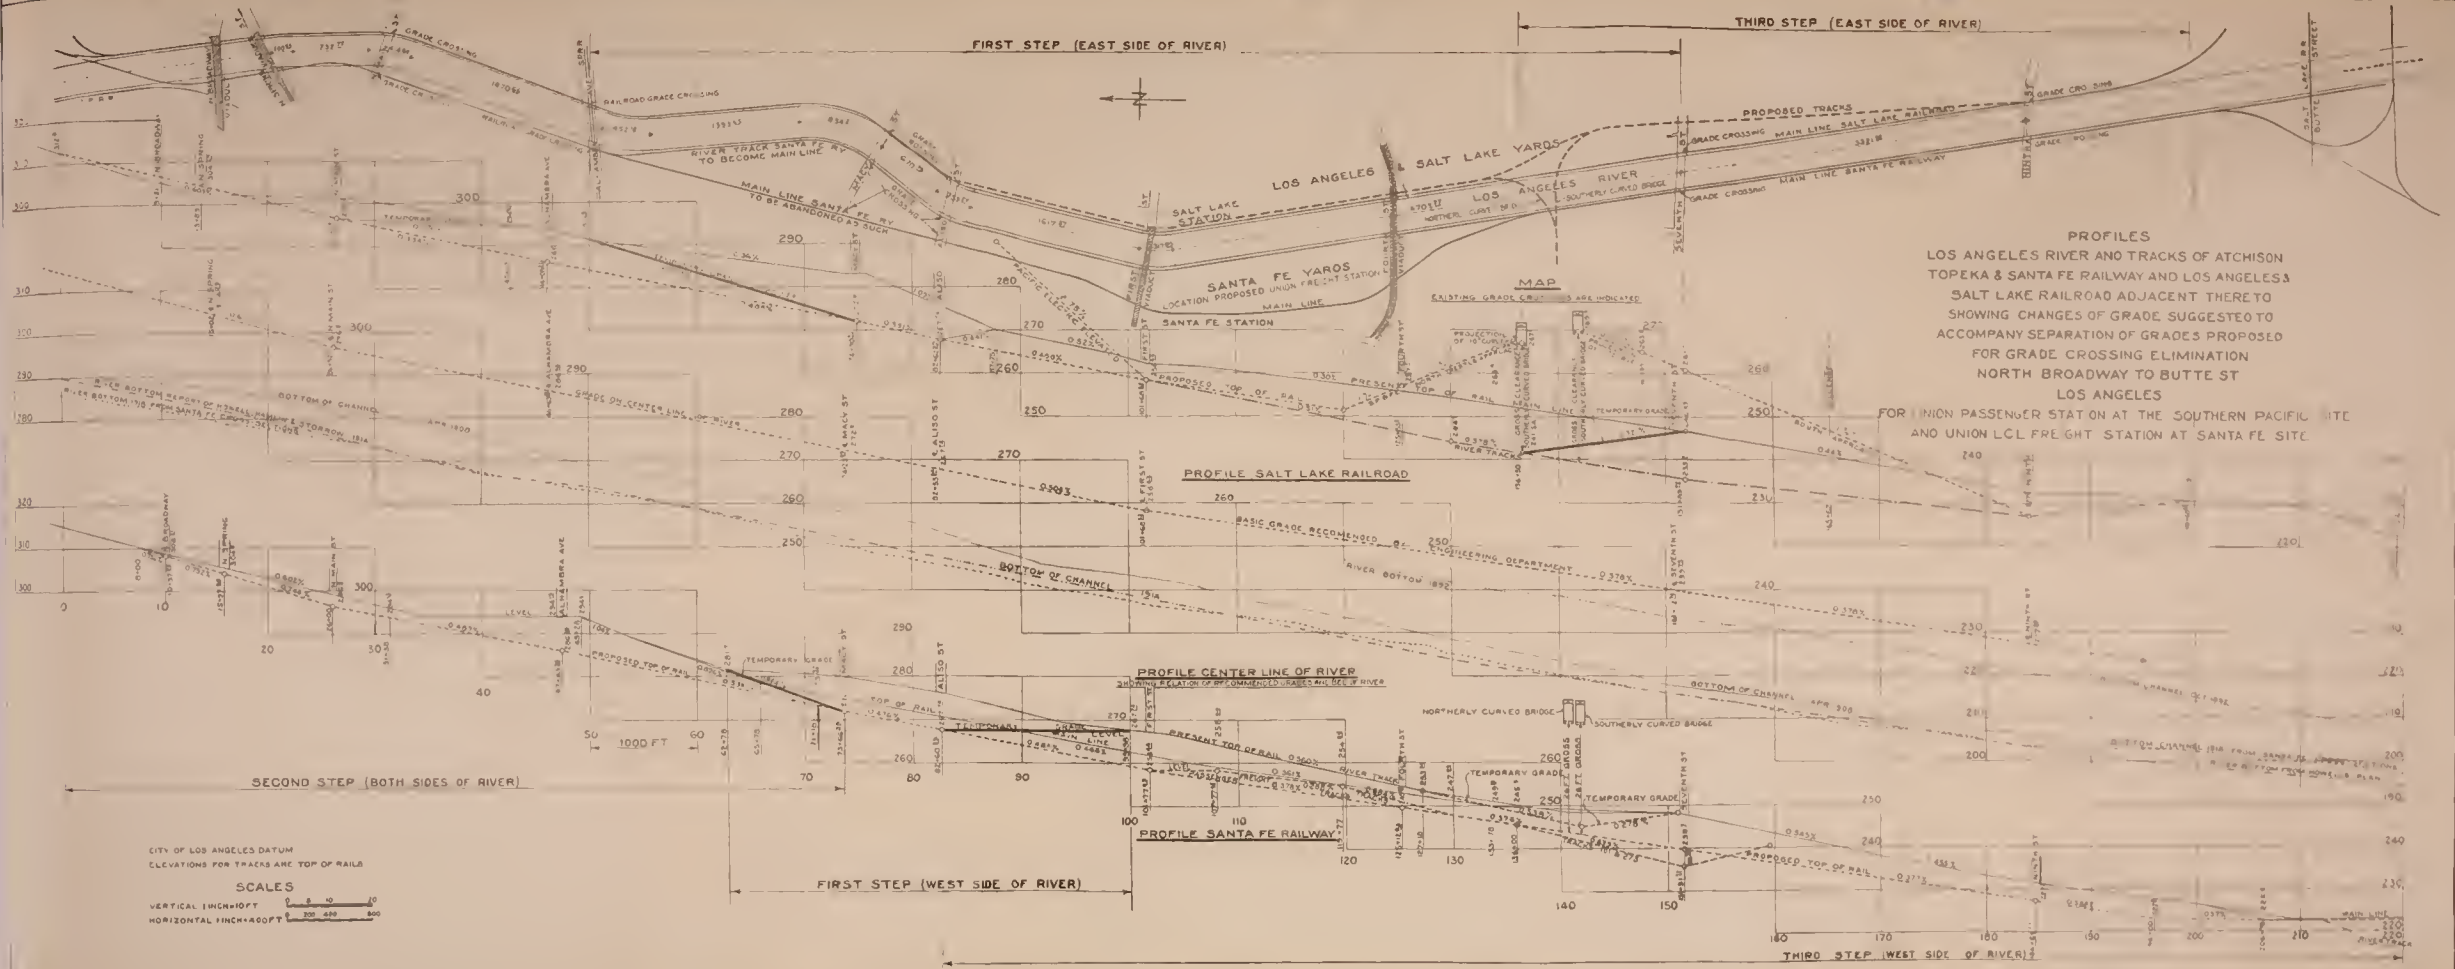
PROFILES OF RIVER BANK TRACKS ACCOMPANYING PLAN FOR UNION STATION AT THE SANTA FE STATION SITE.
